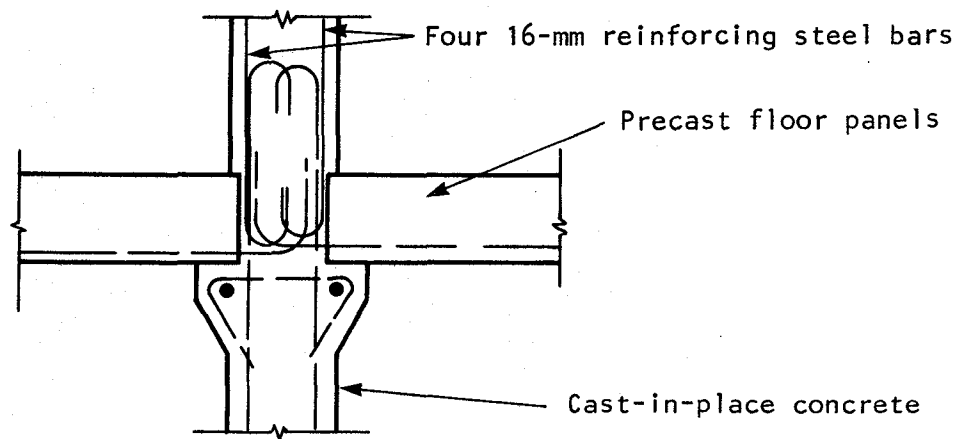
A detailed view of the connection between the reinforcing steel and the concrete.
